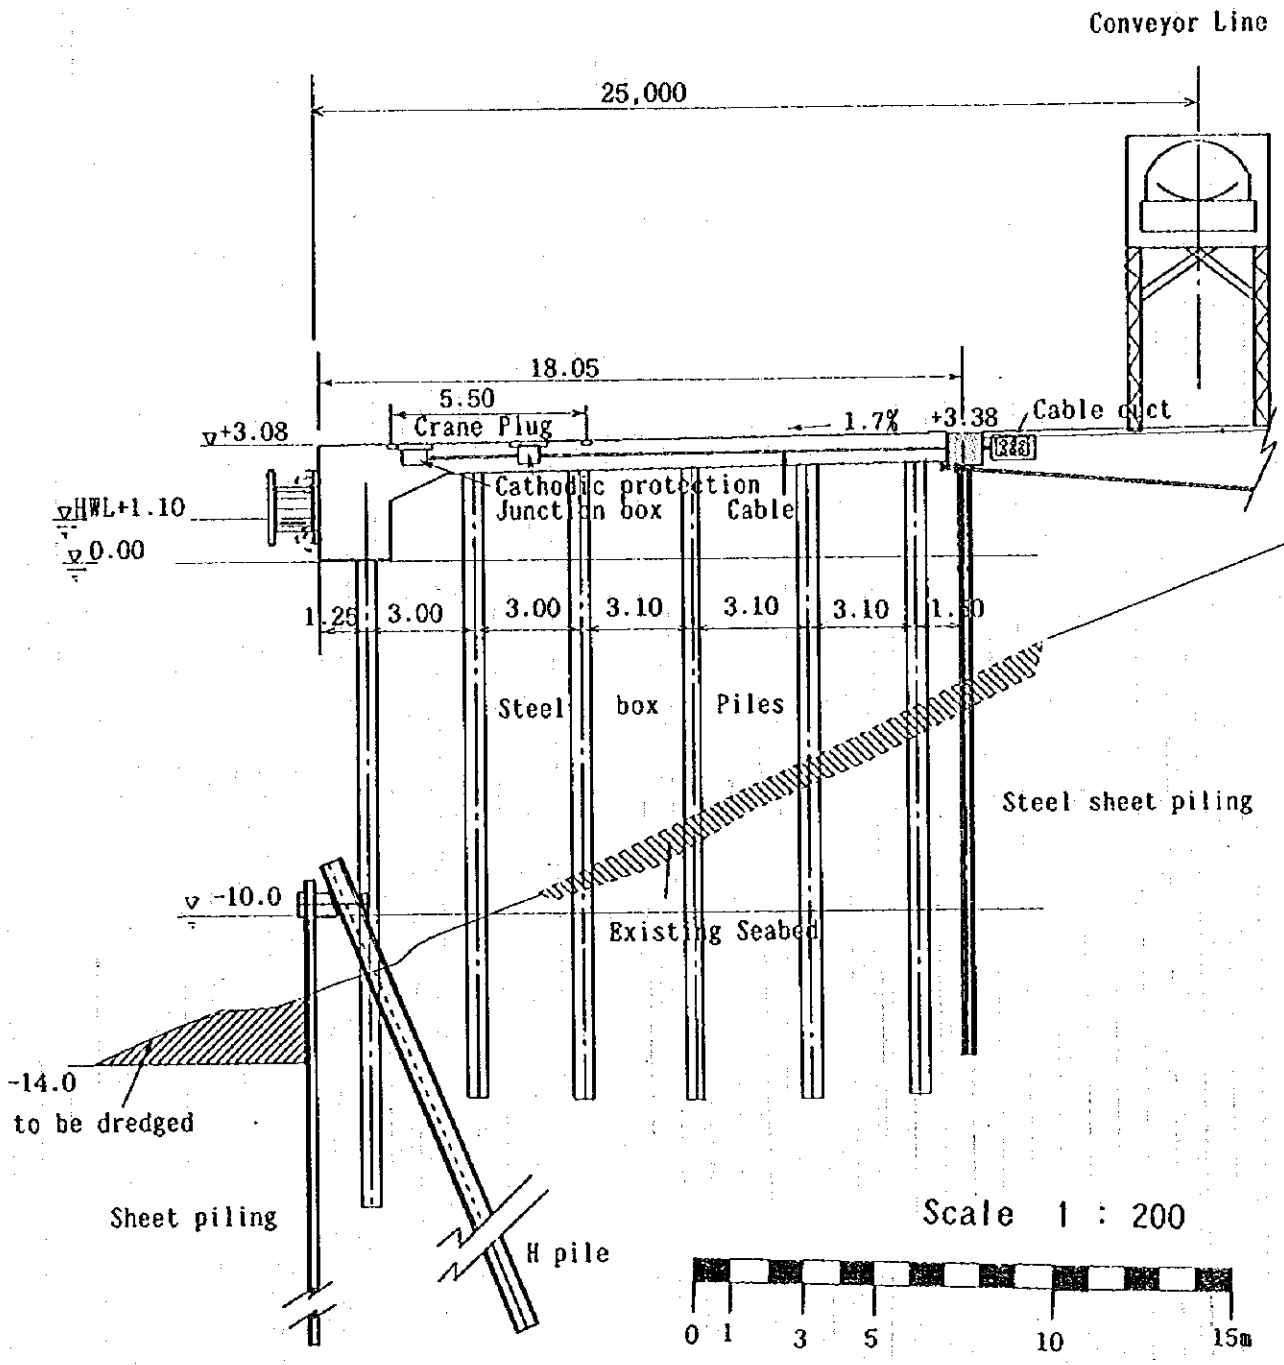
(2) Typical Section of New Grain Berth at GC Berth No.2
